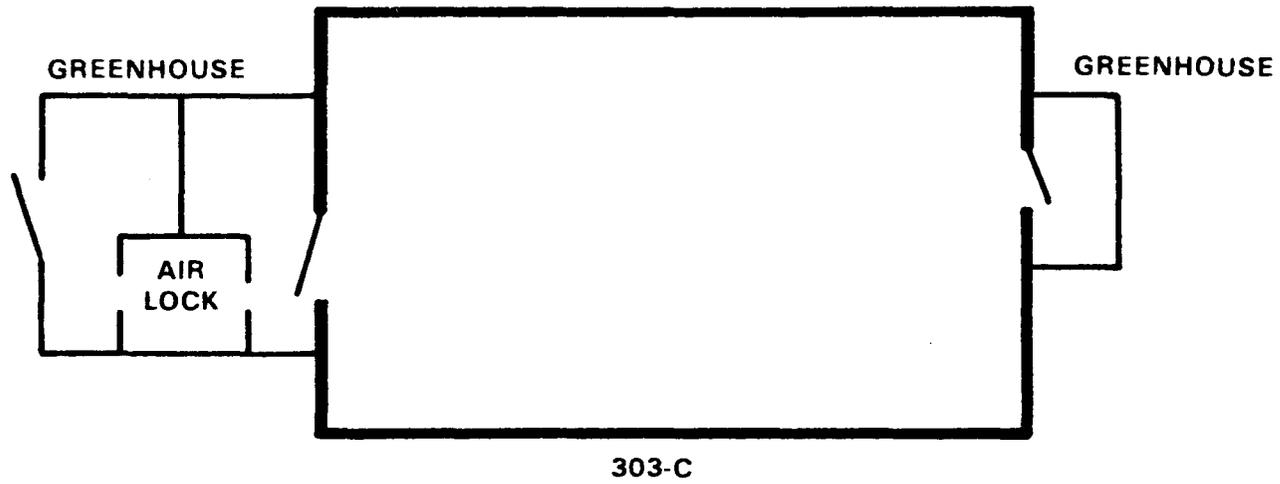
Greenhouse Construction for Decontamination Access to 303-C Building
